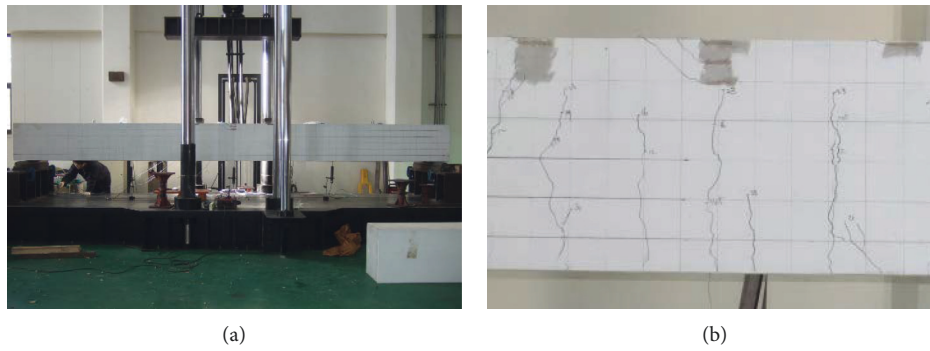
Loading test. (a) UTM setup. (b) Loaded specimen.
